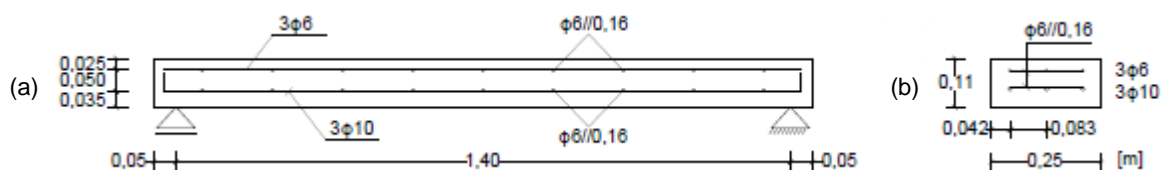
Reinforcement distribution: (a) longitudinal view of slabs; (b) cross section of slabs.
